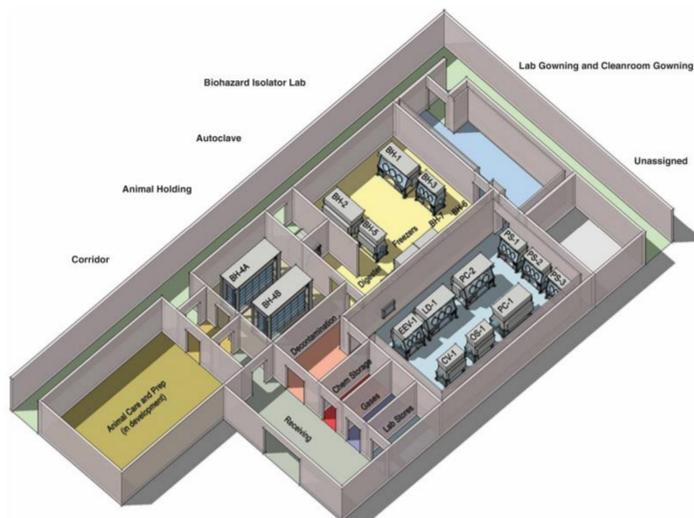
The Mars Sample Receiving Facility floor plan proposed by the Industrial Design and Construction group, reproduced from Beaty et al. (2009)
